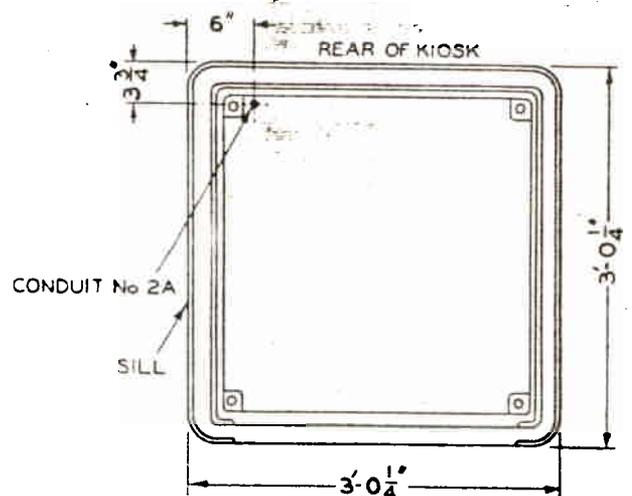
A. POSITION FOR LEAD-IN CONDUIT No. 2A, WHEN CAPPING, STEEL, No. 6 IS USED
